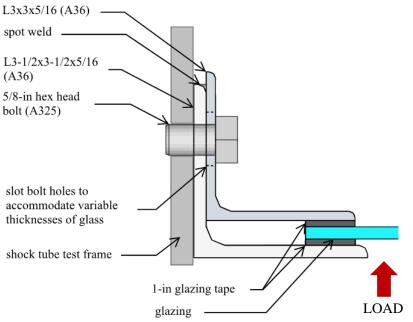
Typical Shock Tube Window Connection: Single Lite Layup
